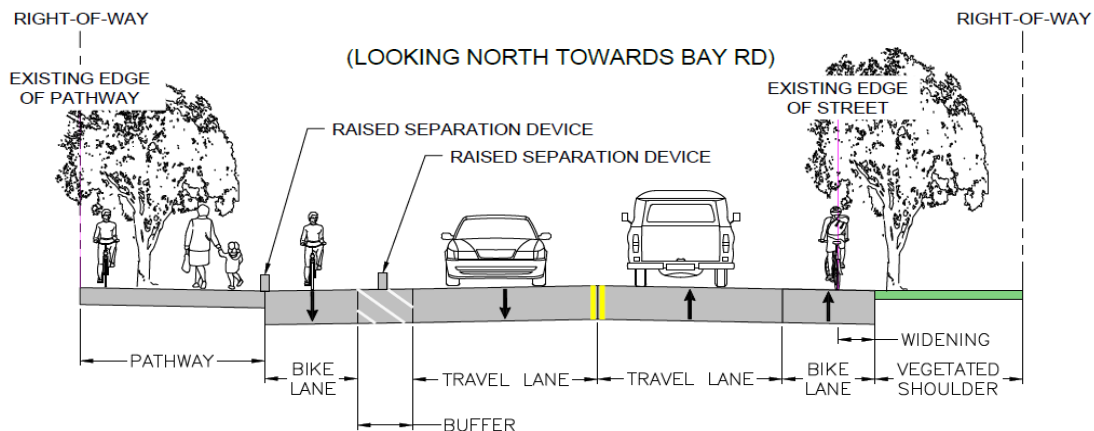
Ringwood Avenue (Laurel School Lower Campus) Long-term Alternative Bike Lanes (Protected near Schools) with Off-street Pathway
